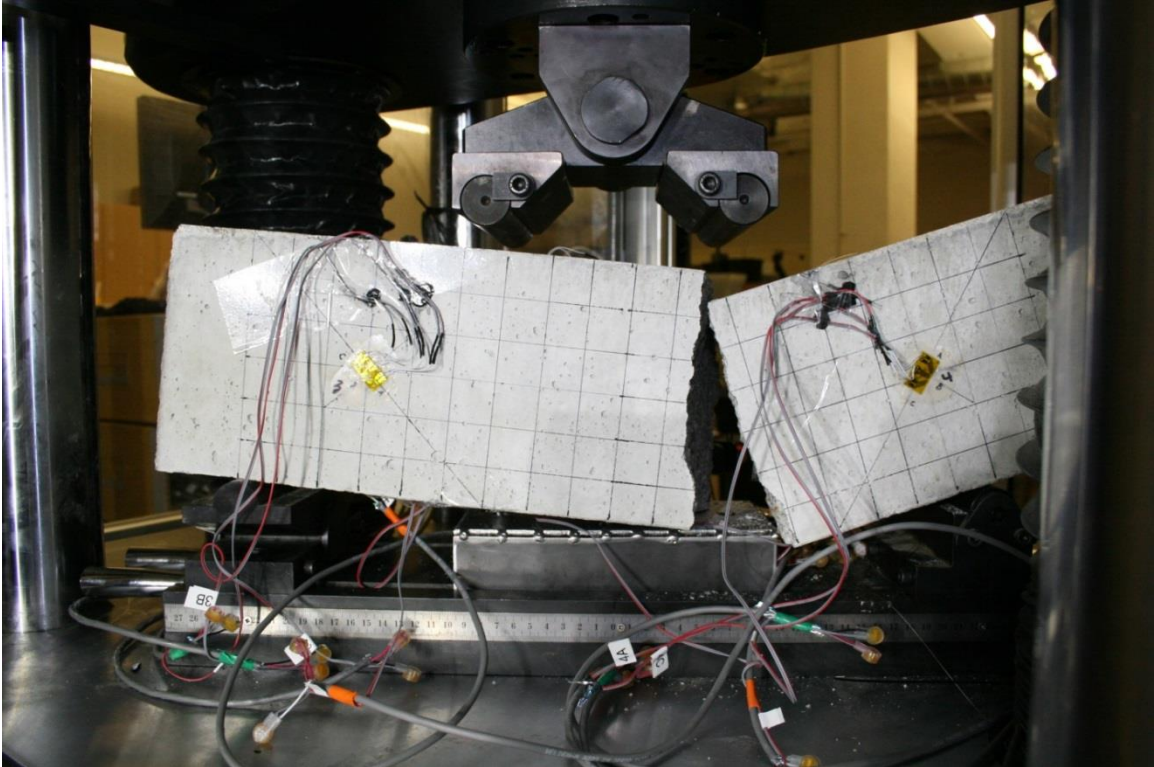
Additional Post-Test Damage, Test No. CFS-1 [18-in. (457-mm) Span]
